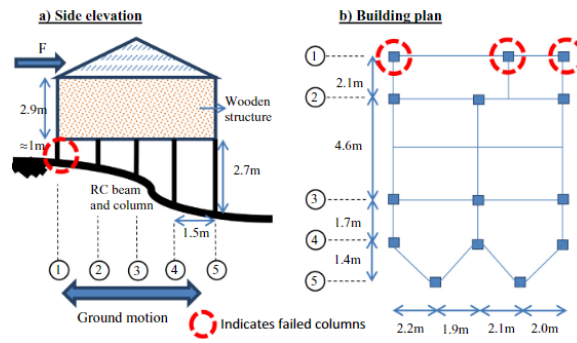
8: Building configuration measured on site and columns' grid as reference: (a) Side elevation, (b) Building plan (Alih S., et al., 2019).
